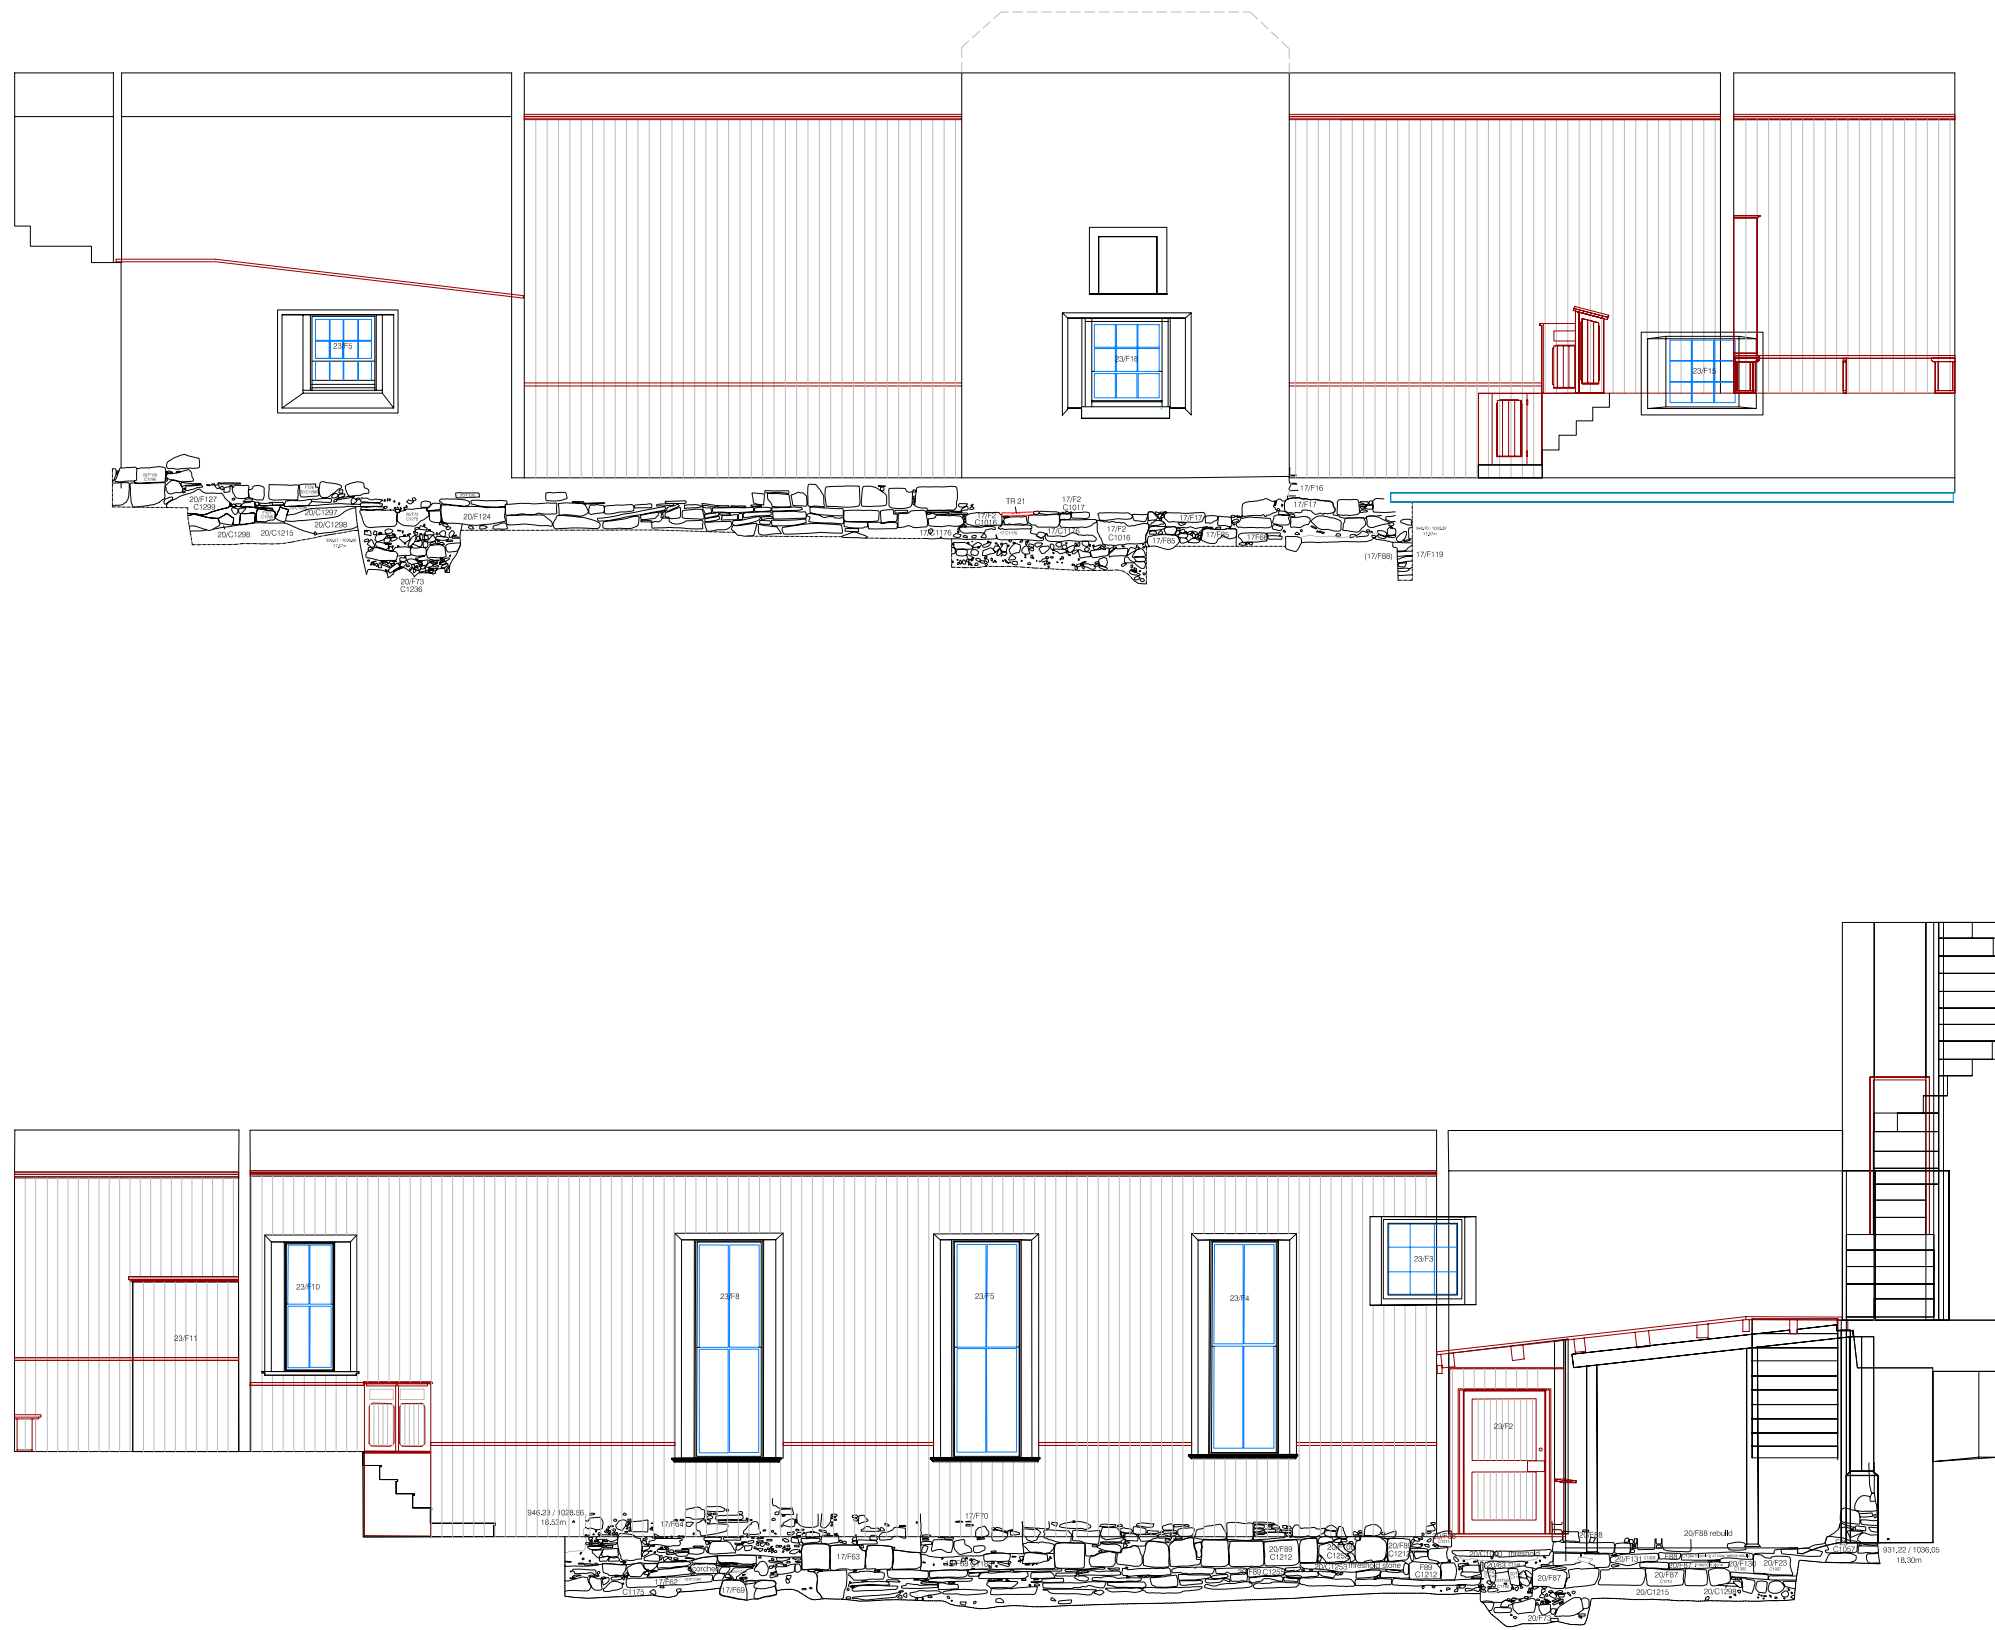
Church 2 south wall foundation and elevation 17/F62 and F63 (scale 1.0m)
